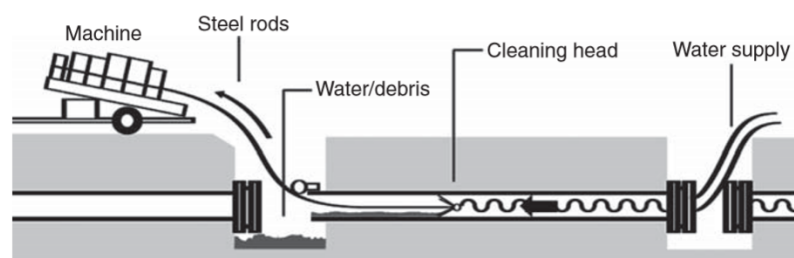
Rack (hanger)-feed boring machine using steel rods. (Source: Water UK)
